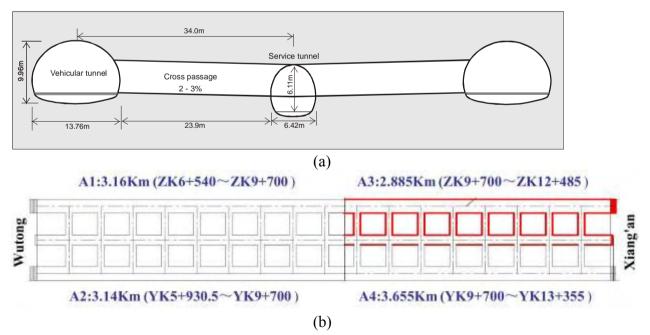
(a) A cross section of the main tunnels and the service tunnel. (b) Sketch map on contract sections of Xiang'an tunnel^[3]
